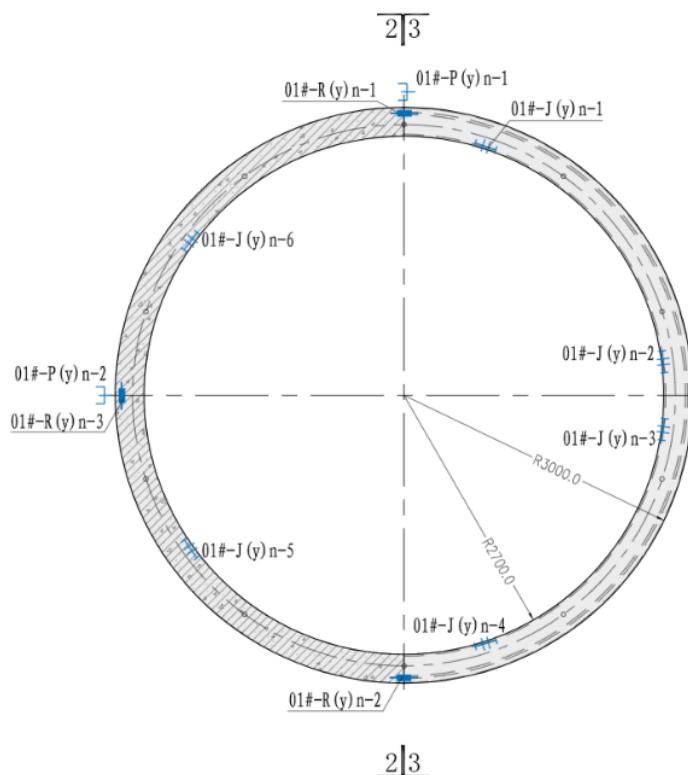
Layout of monitoring instruments for tunnel monitoring cross-sections
